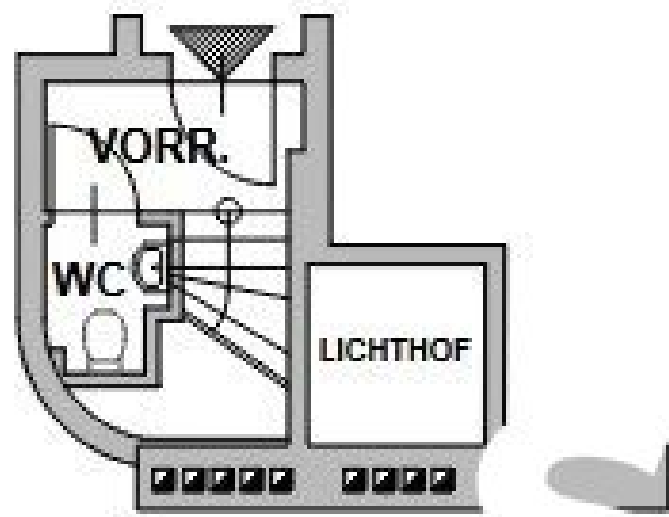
Floor plan of the building used for the experiment. The building is a small, single-story structure with a central hallway and three main rooms: a storage room (VORR.), a toilet (WC), and a lightwell (LICHTHOF). The building is situated on a small island with a grid of windows and a central entrance area.
